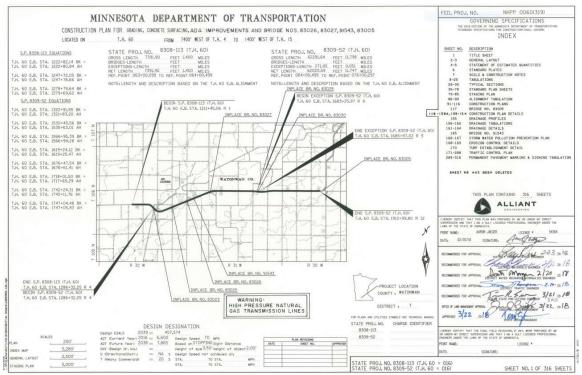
MnDOT construction plans for S.P. 8308-113 and S.P. 8309-52
